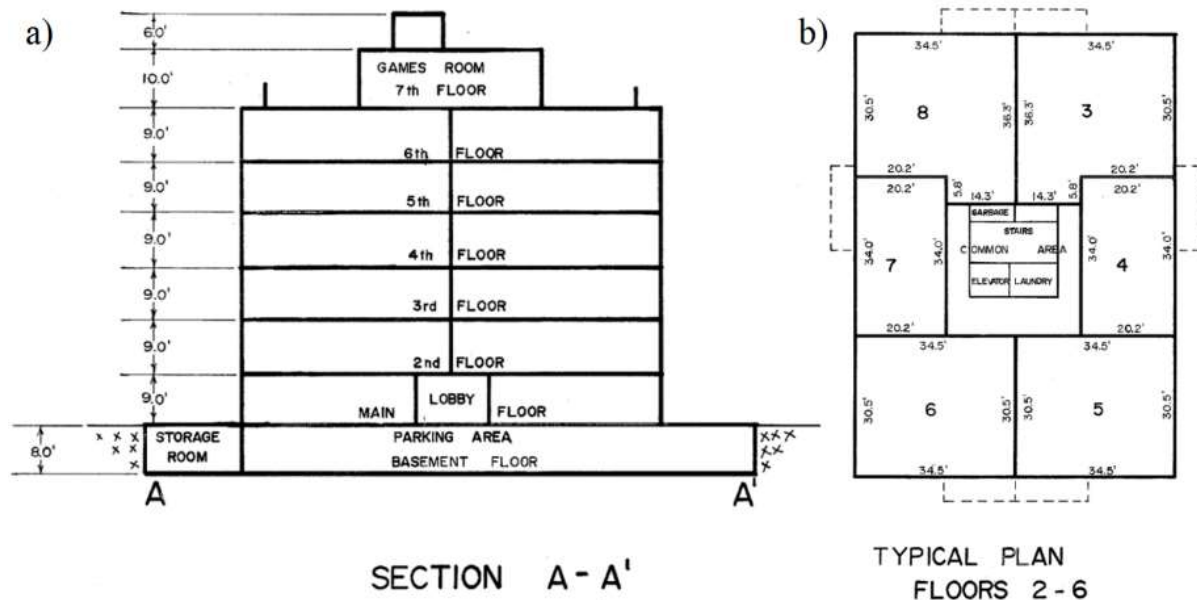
Condominium Building Cross Section and Typical Floor Plan
